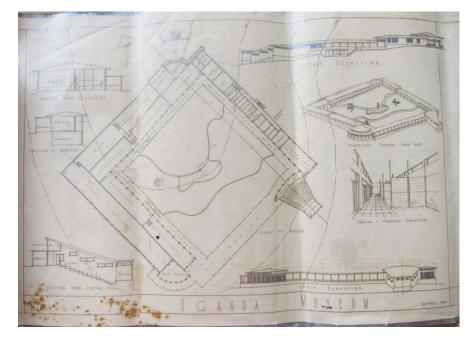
Uganda Museum, plan of museum, section galleries, section offices, section lecture hall, east and south elevation, perspective sketch, 1949 (not realized) (Uganda National Museum archive)
